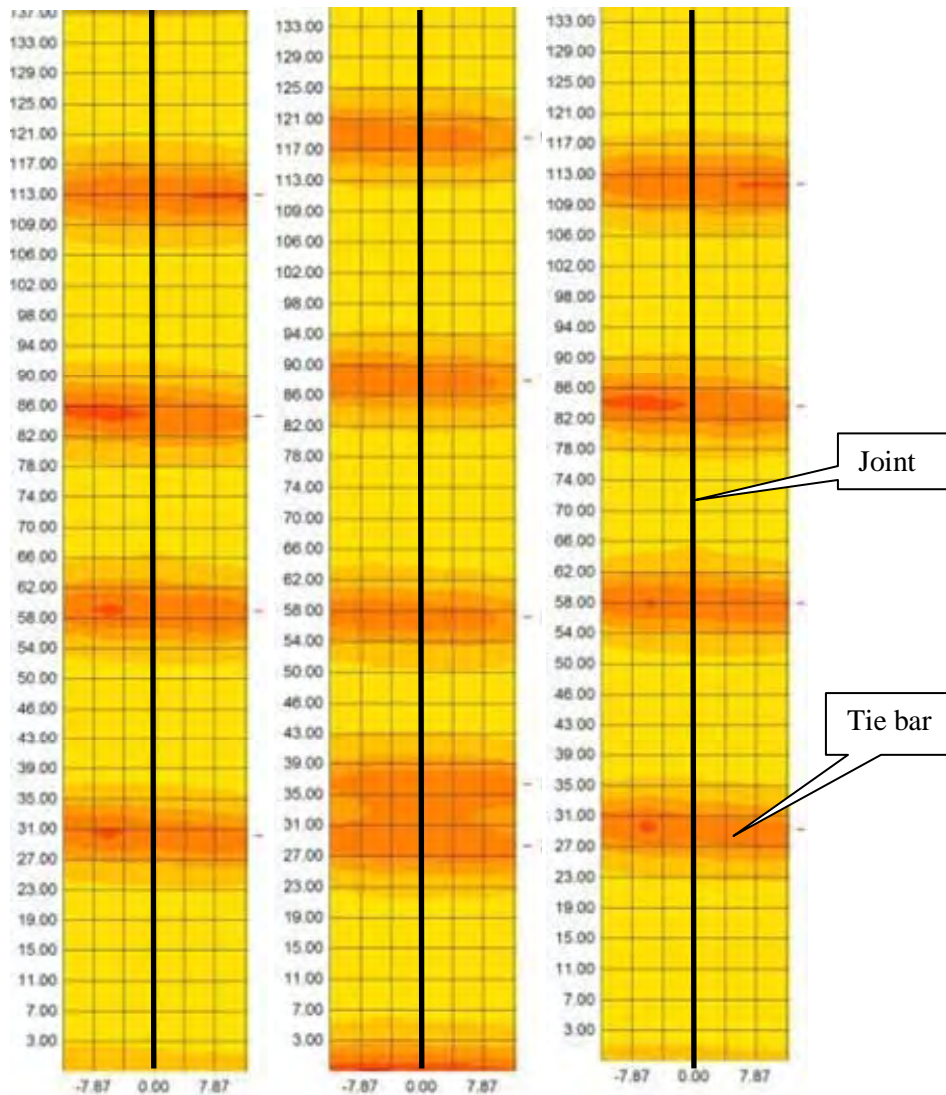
MIT Scan images of control joints at Hugo site (A left, B center, C right all show tie bars in place).
